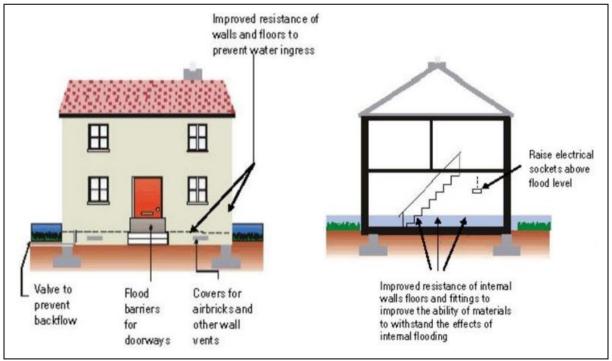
Examples of dry (left image) and wet (right image) flood proofing techniques
